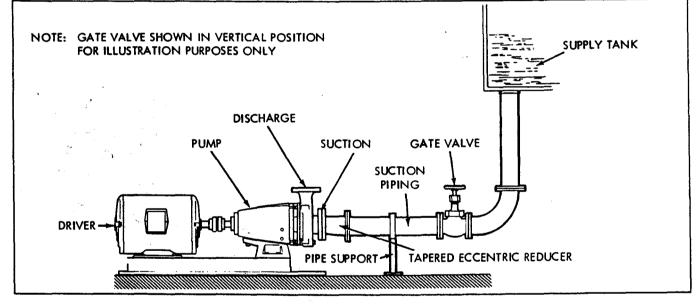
RECOMMENDED FLOODED SUCTION PIPING - SHORT AND DIRECT
